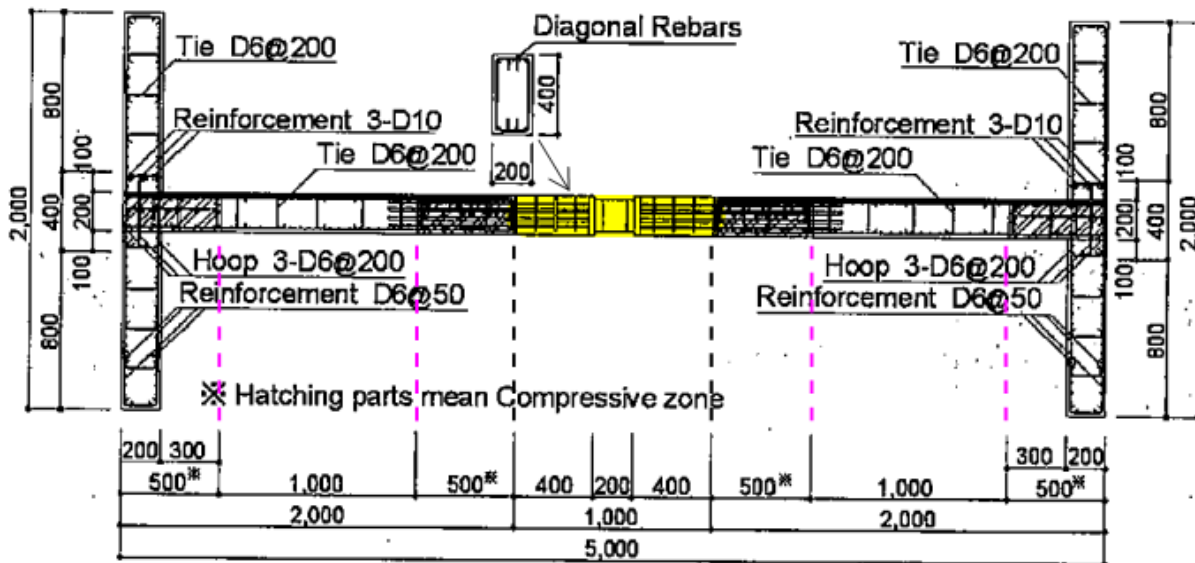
Wall Reinforcement (Sugaya et al., 2003)
